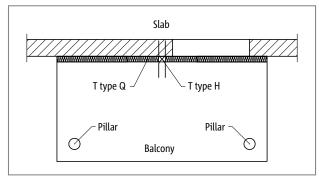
Schöck Isokorb® type Q: Balcony with pillar support
